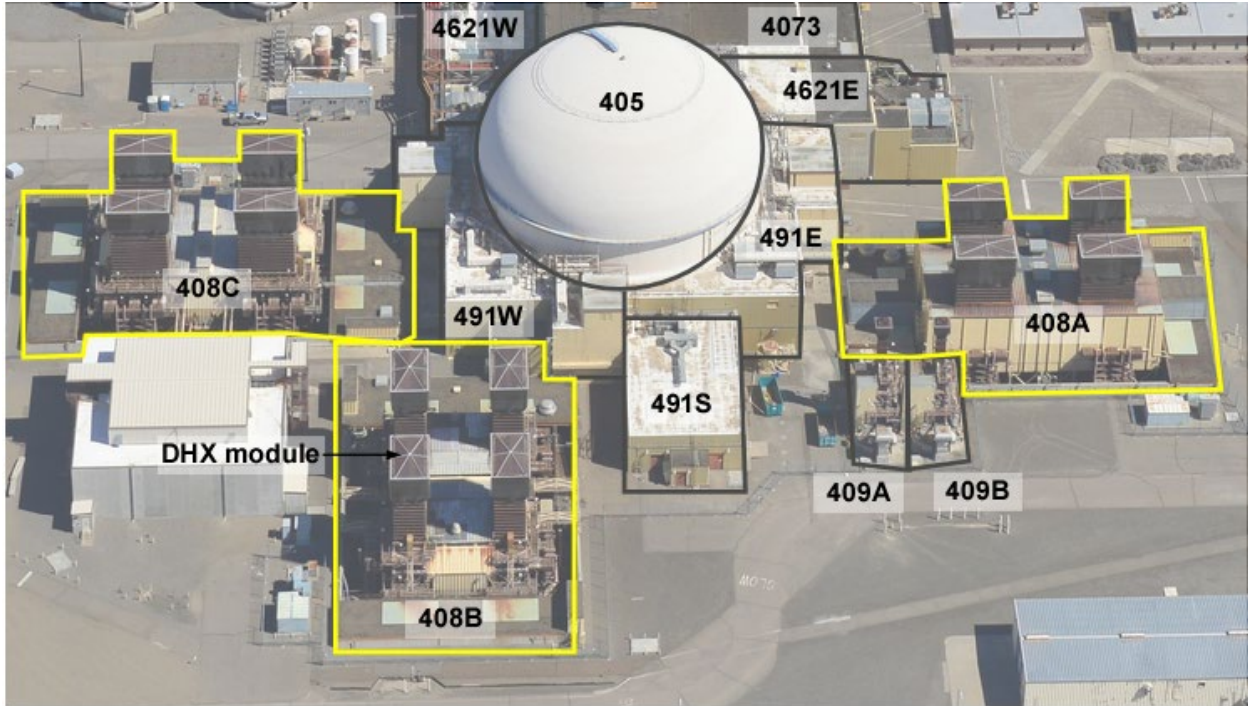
408A, 408B, and 408C Dump Heat Exchanger Structures
